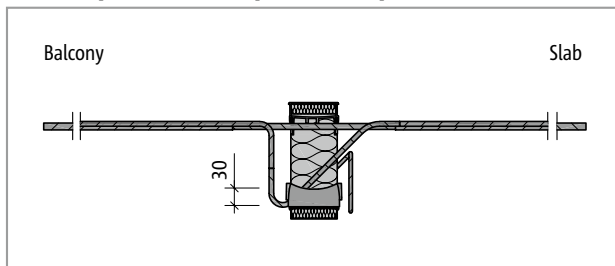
Schöck Isokorb® T type K-M7 to M11: Cross section of the product
